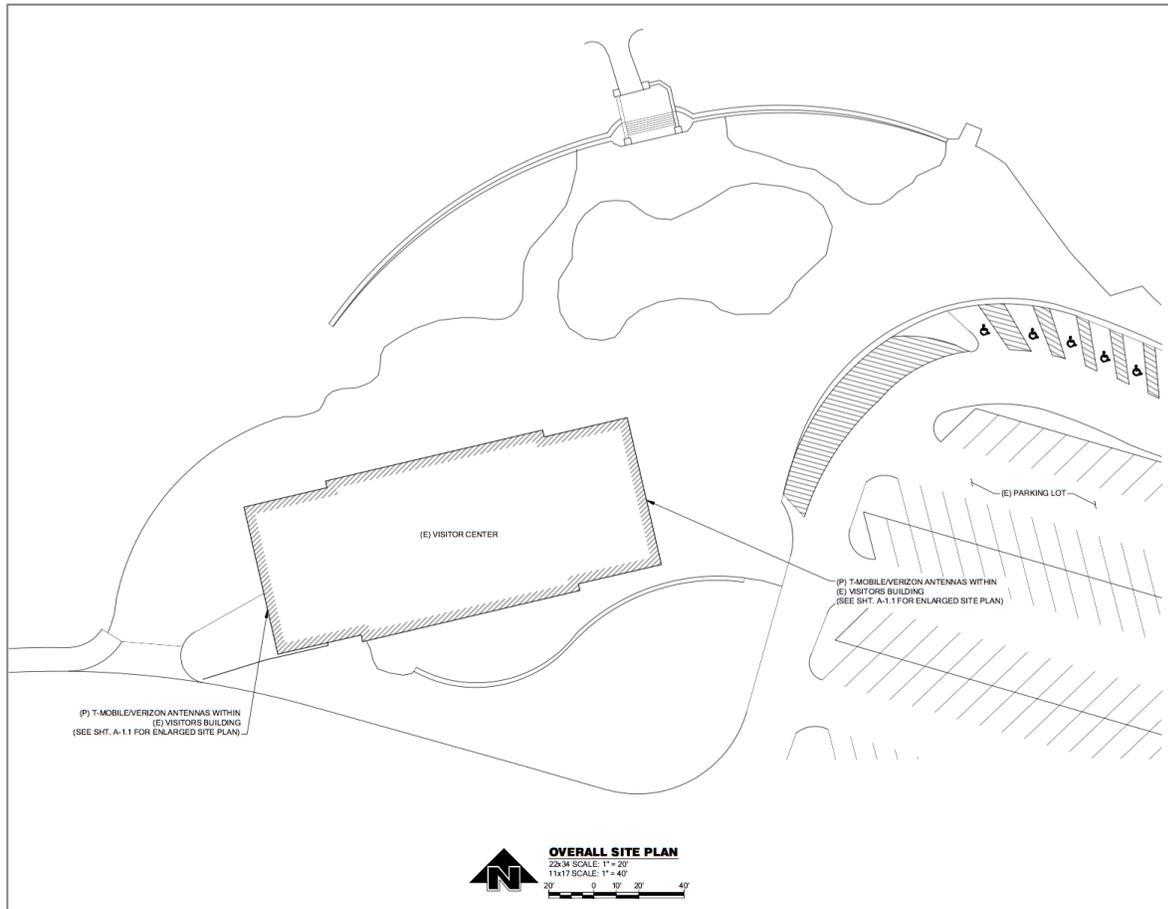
Site plan showing the potential location of antennas within the JVC Attic on West and East gable ends. (from sheet A-1, Verizon and T-Mobile draft plans, May 12, 2016).
